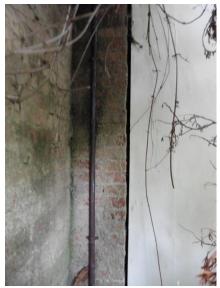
Perimeter brick wall (left) and building's south façade (right) showing the lack of accessibility to the west façade, facing north.
